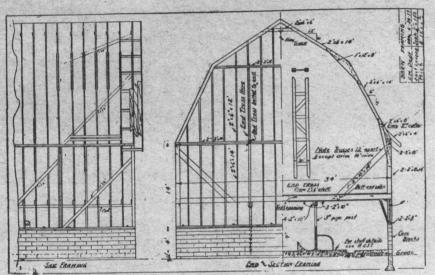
Details of Framing for Plank Frame Barn Thirty-four Feet Wide.
